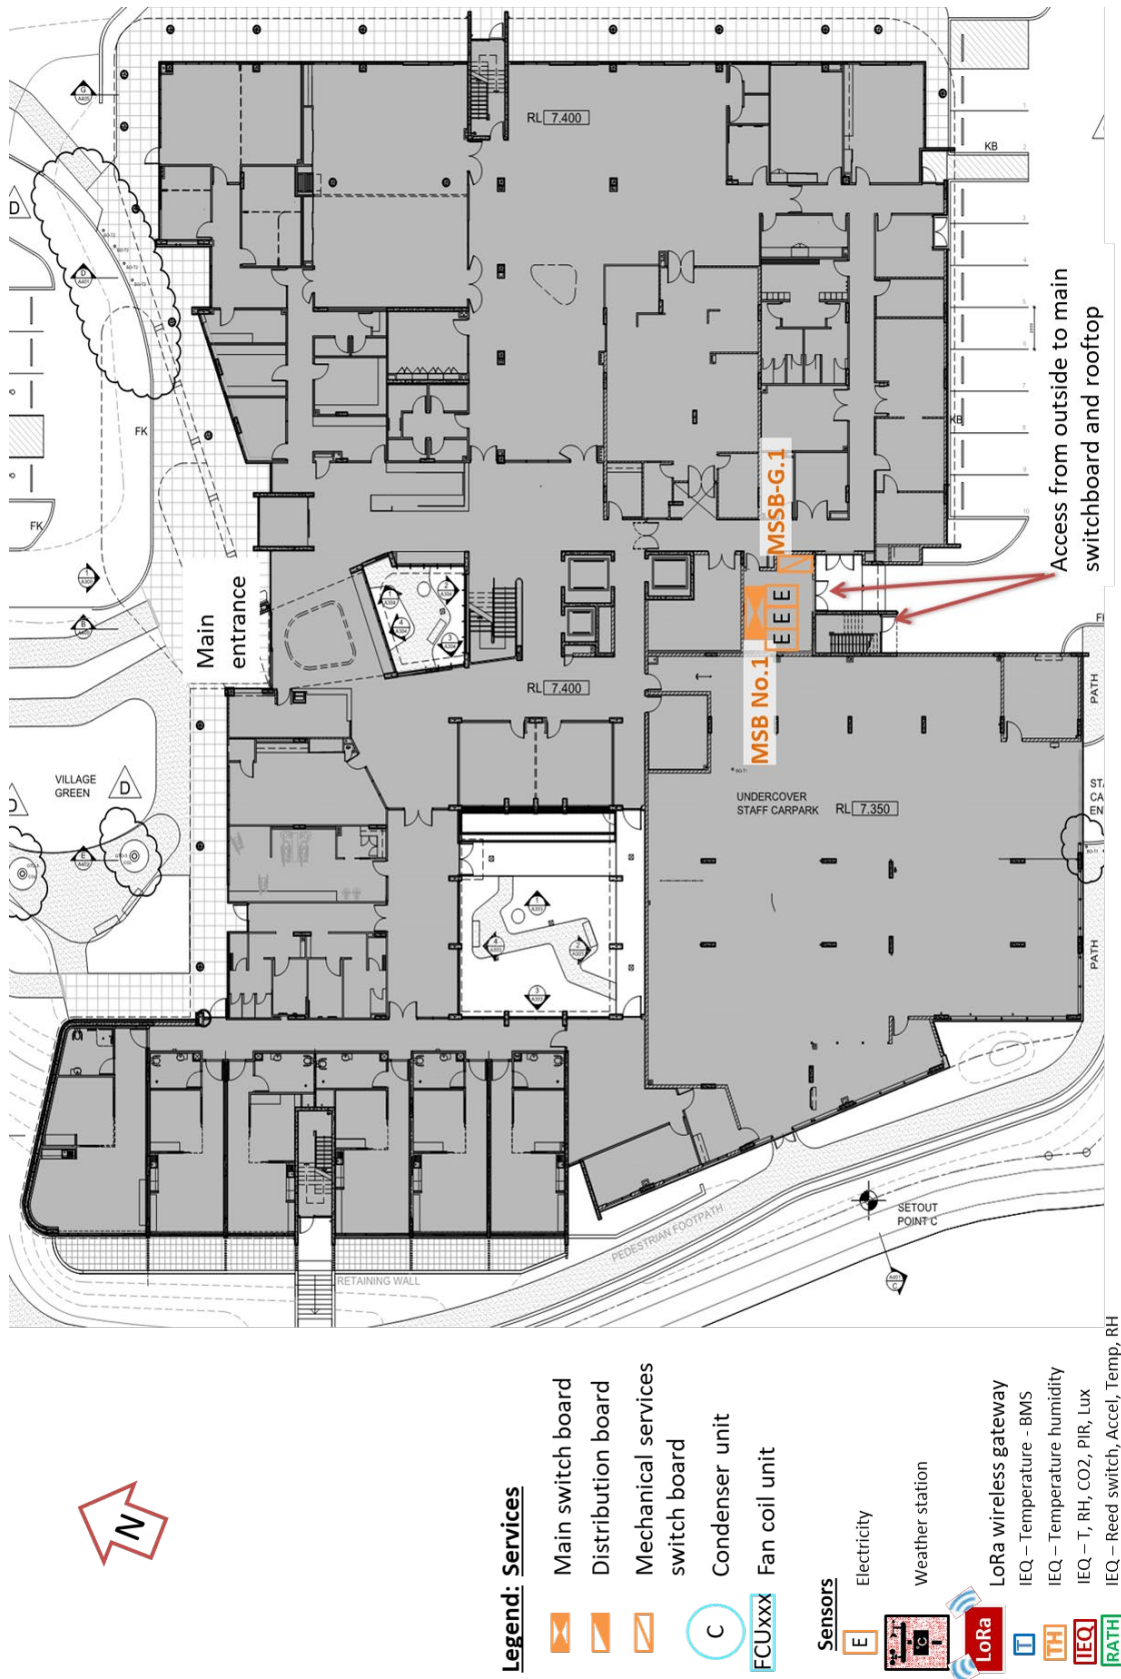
Warrigal site metering and monitoring ground level layout.
